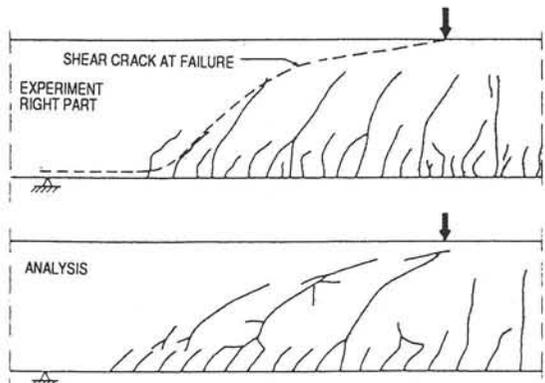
Crack Patterns (Blaauwendraad, 1981)
